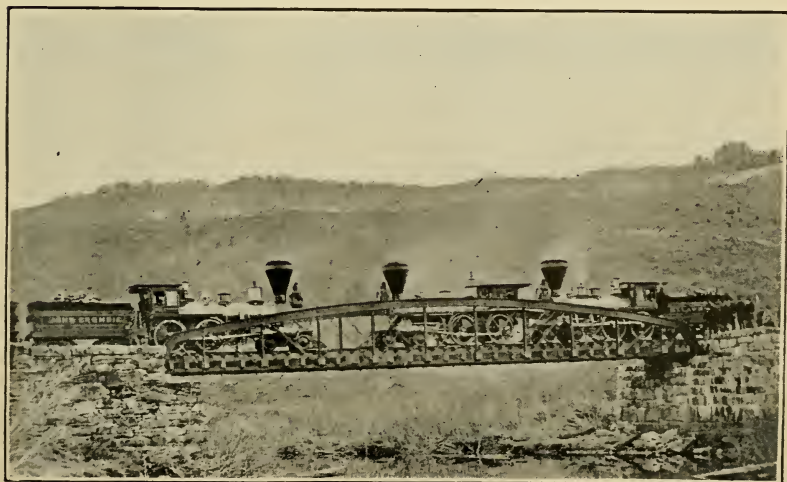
BRIDGE AT NORTH WOODSTOCK, VT.
